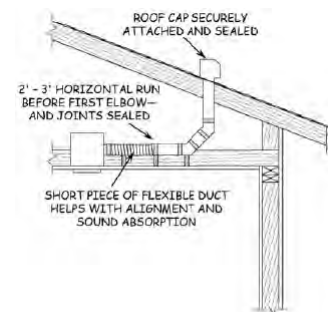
VERTICAL DUCT INSTALLATION AND TERMINATION
